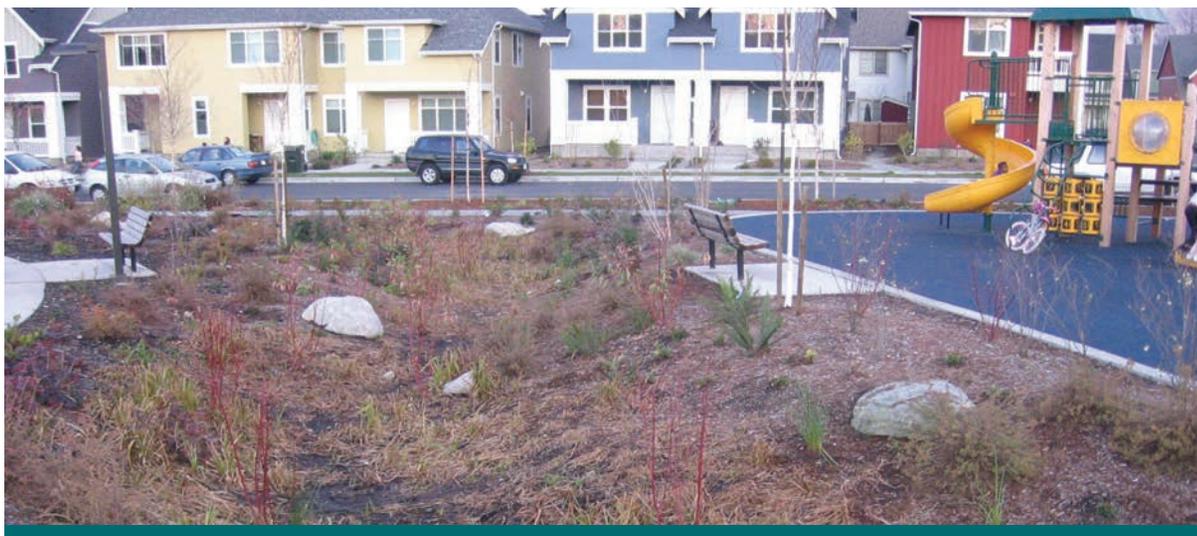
When installing new parks equipment, consider whether the LID practices can be integrated into the design. Here a bioswale has been built into the landscape between a playground and sidewalk. (Source: CVC)
